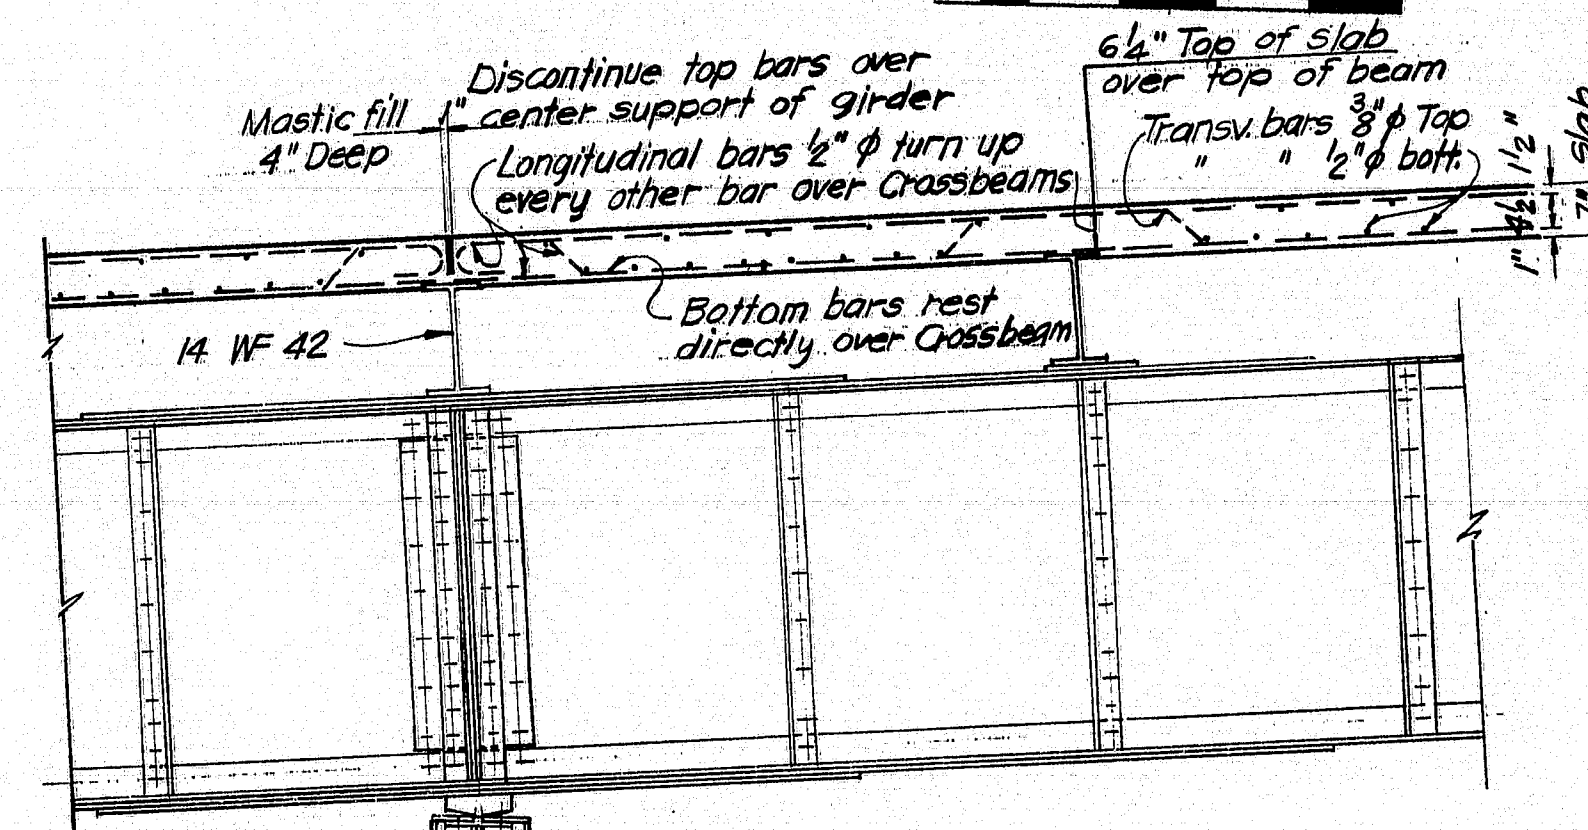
DETAILS OF ROADWAY DECK SLAB - SUSPENDED SPANS
